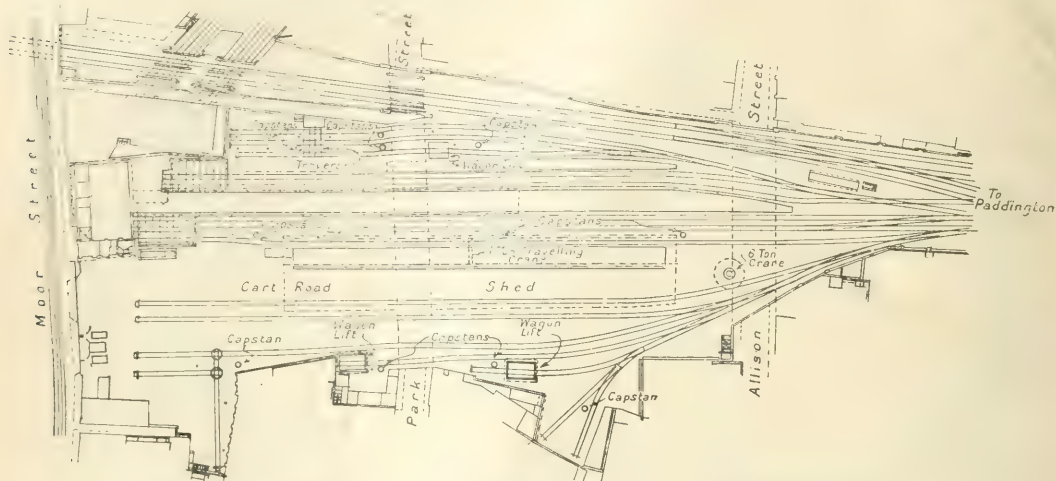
PLAN OF HIGH-LEVEL YARD AND SHED AT MOOR STREET GOODS STATION, BIRMINGHAM.
